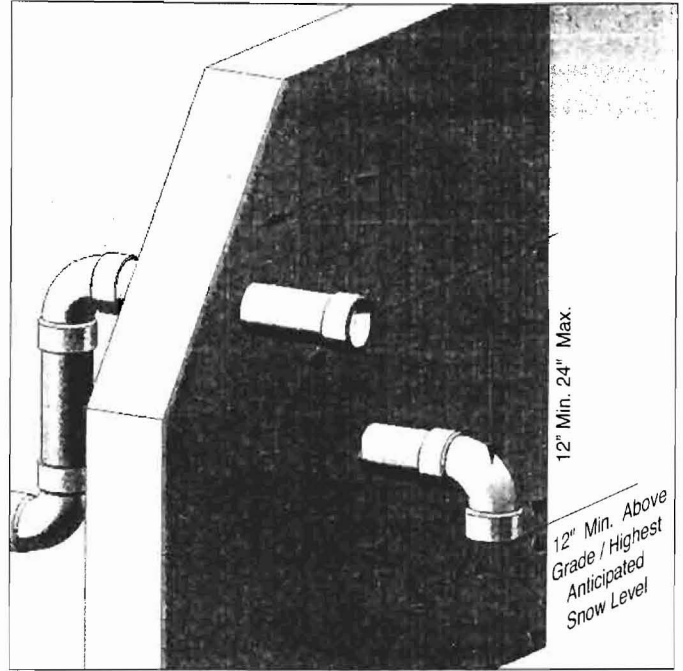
Direct Vent - Alternate Sidewall Termination of Vent and Combustion Air Piping
